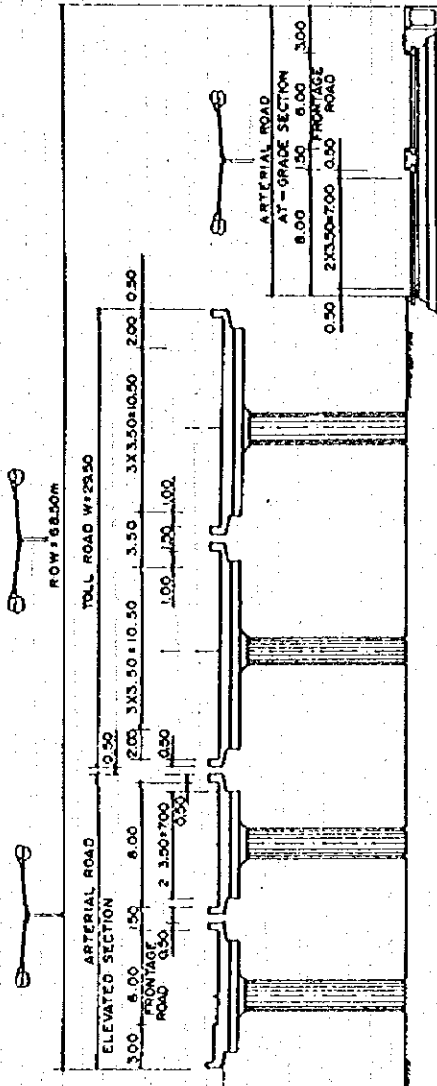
Typical Cross Sections for Route-1(1/2)
